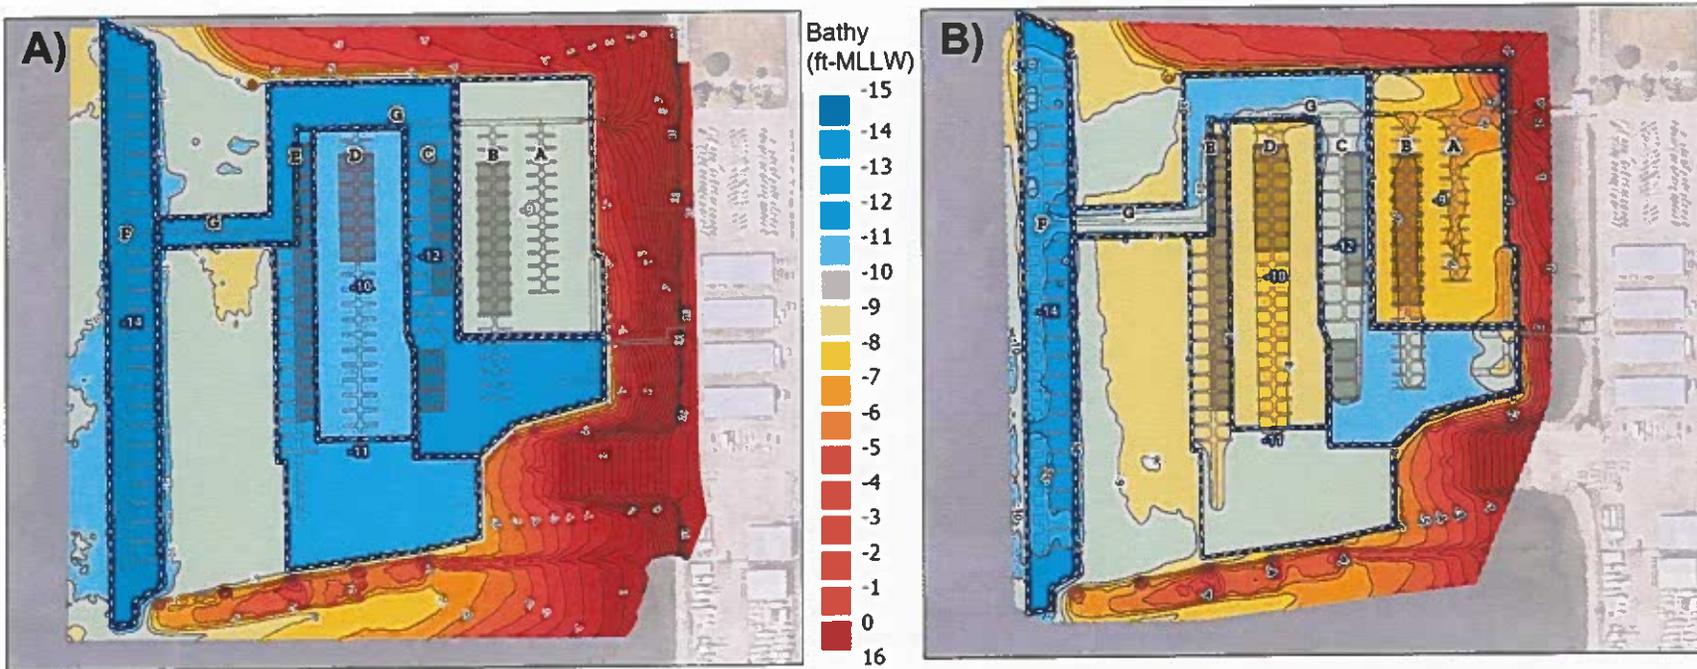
Alternative 3 Dredge Plan (A) and Dredge Plan Aged 10 years (B)
